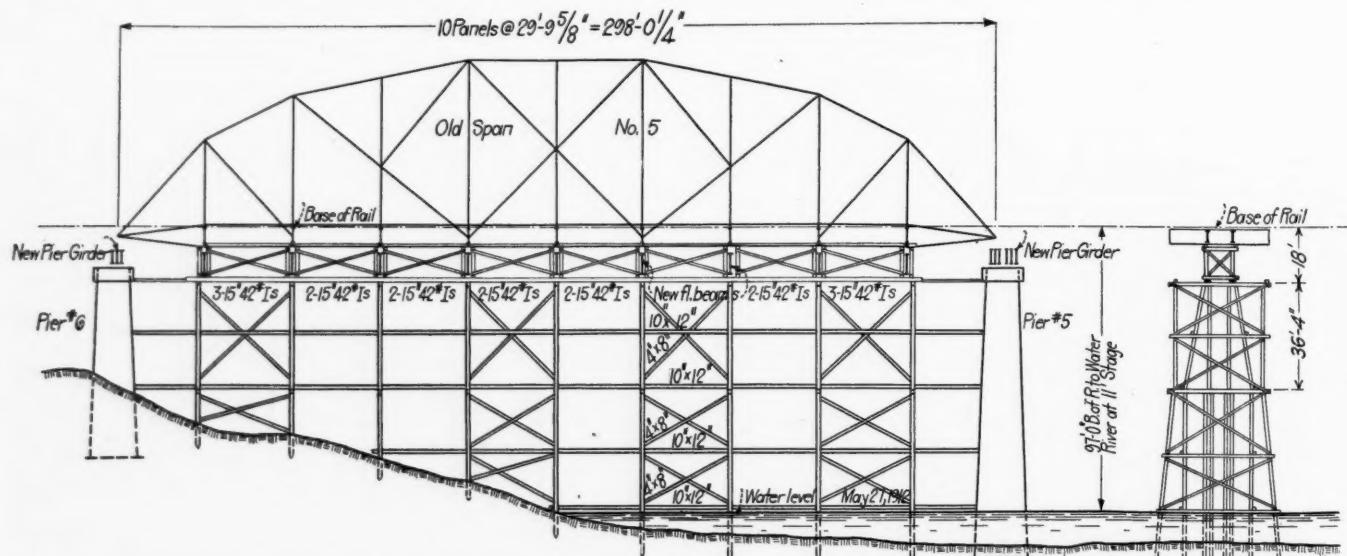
False Work Used in Erecting End Spans Showing Pony Bents Supporting New Floor Beams.
